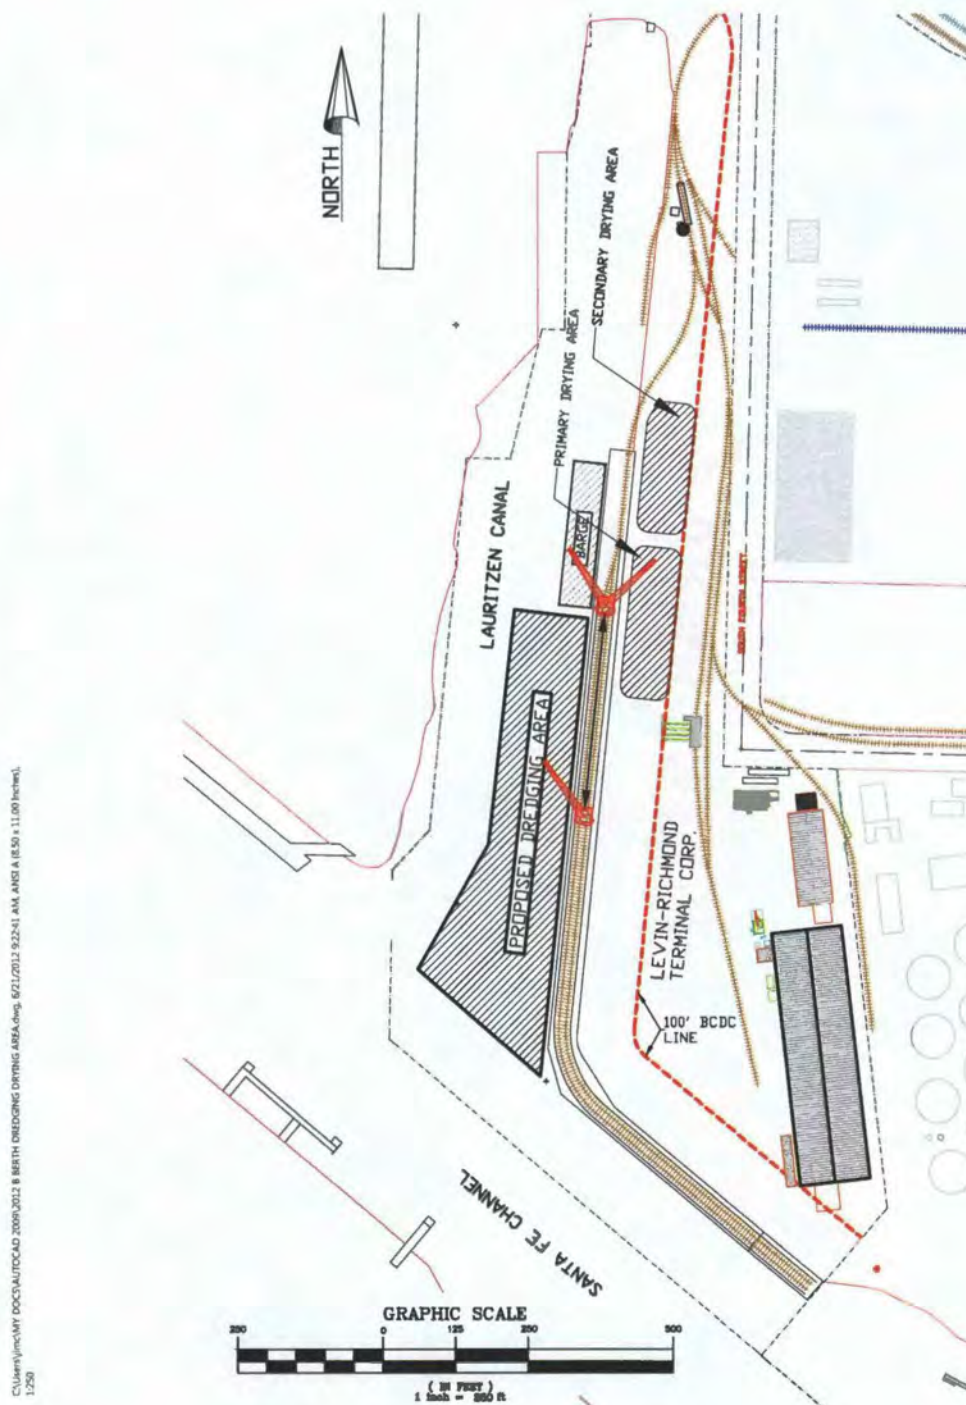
Site Plan for Berth B On-Site Sediment Dewatering and Drying Site
